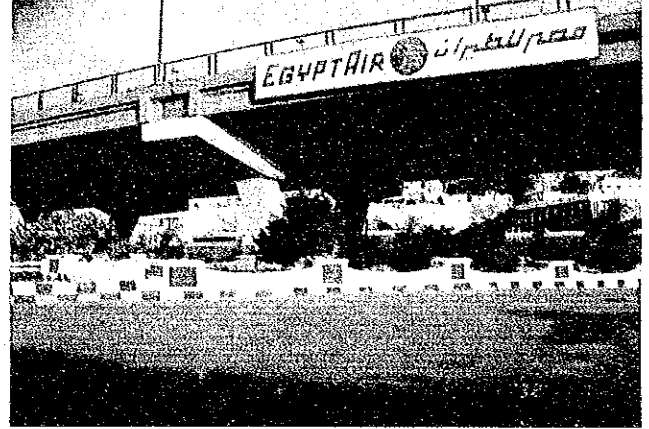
Elevated bridge in Cairo (streamlined rigid frame RC piers)
